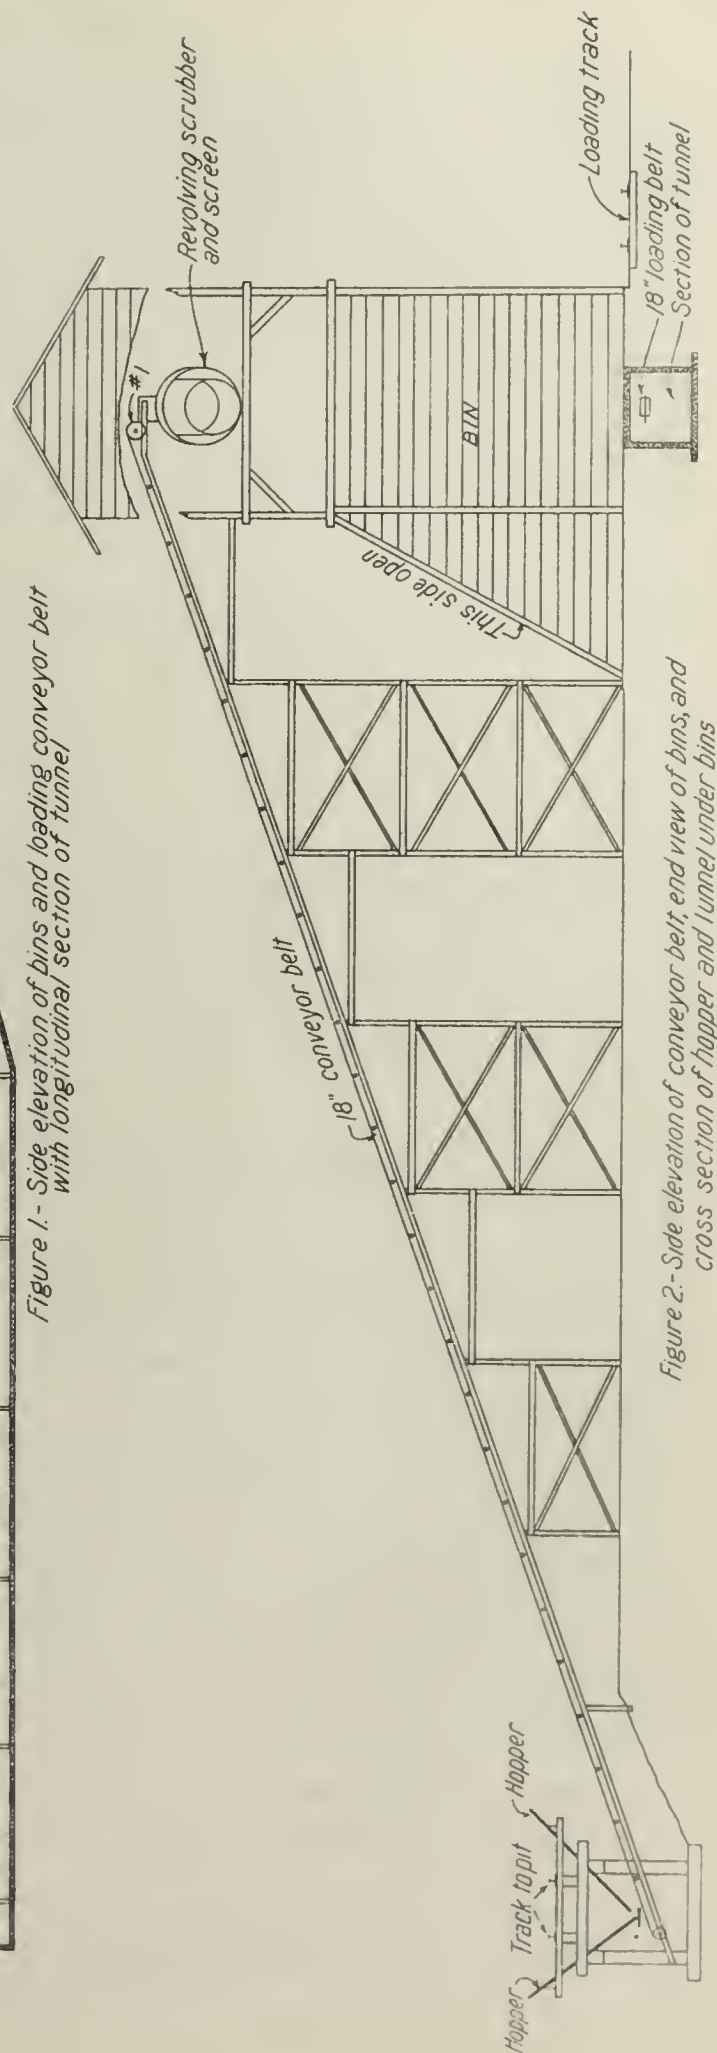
Side elevation of conveyor belt, end view of bins, and cross section of hopper and tunnel under bins
